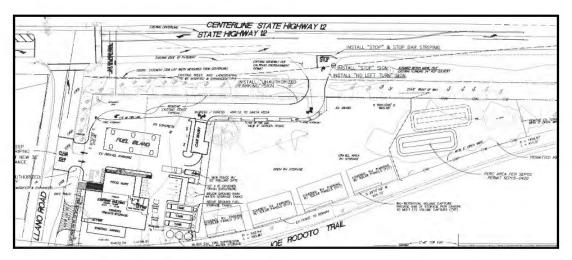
Project Site Plan (Baechtel Hudis, Consulting Civil Engineers & Planners)
